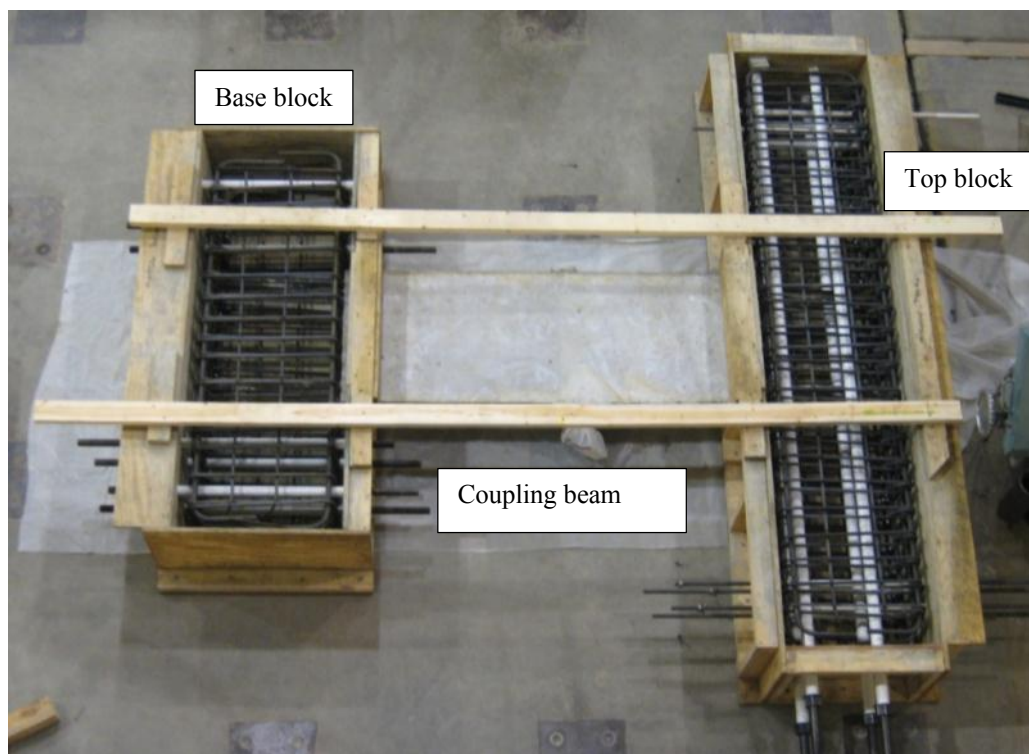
Precast coupling beam connected to base and top blocks representing walls prior to casting of blocks.
